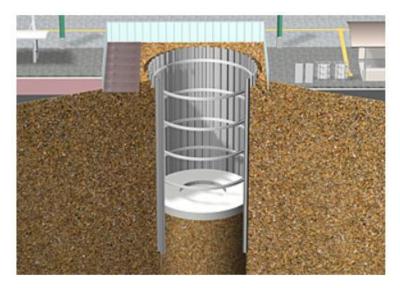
Excavation of soil from the cylinder to create the underground space
